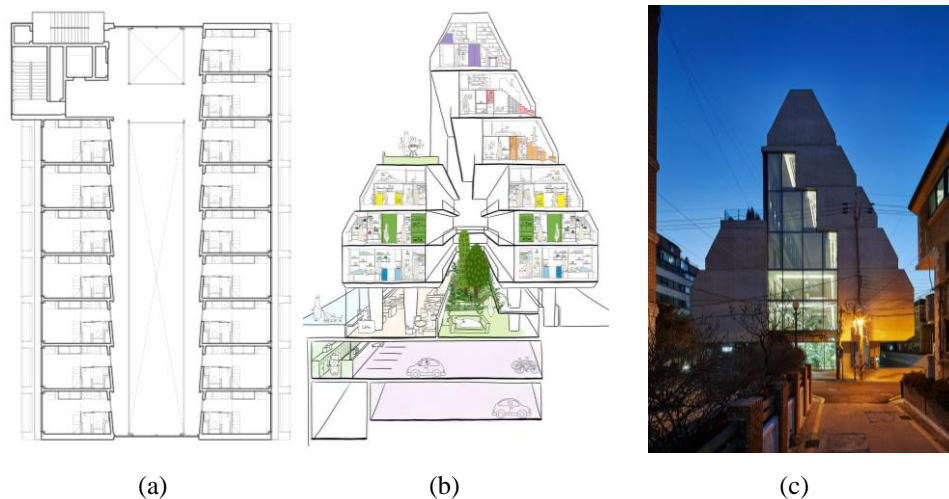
(a) TH 5th floor plan, (b) Perspective section, and (c) TH triangular concrete prism
